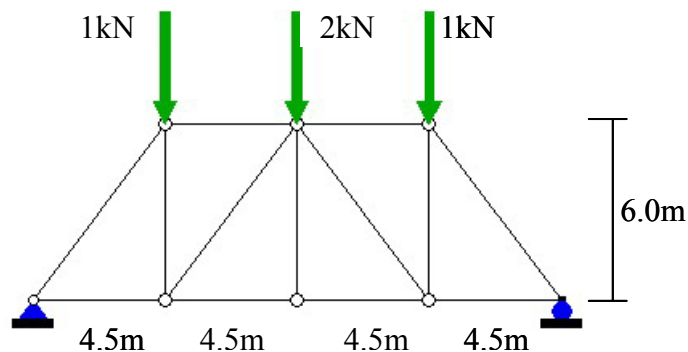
Example of truss loaded by three forces - picture was made in 2D-Statix.
